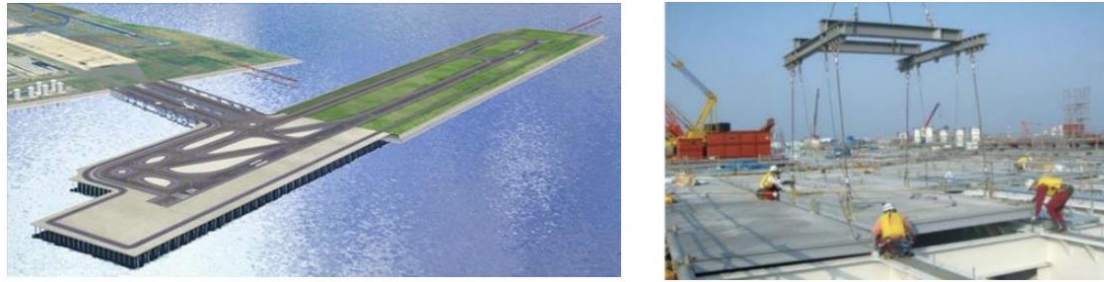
L: The new runway at Haneda airport, where the left side is built with UHPC elements supported by steel piles. R: Placing the prefabricated UHPC elements at site [31]
